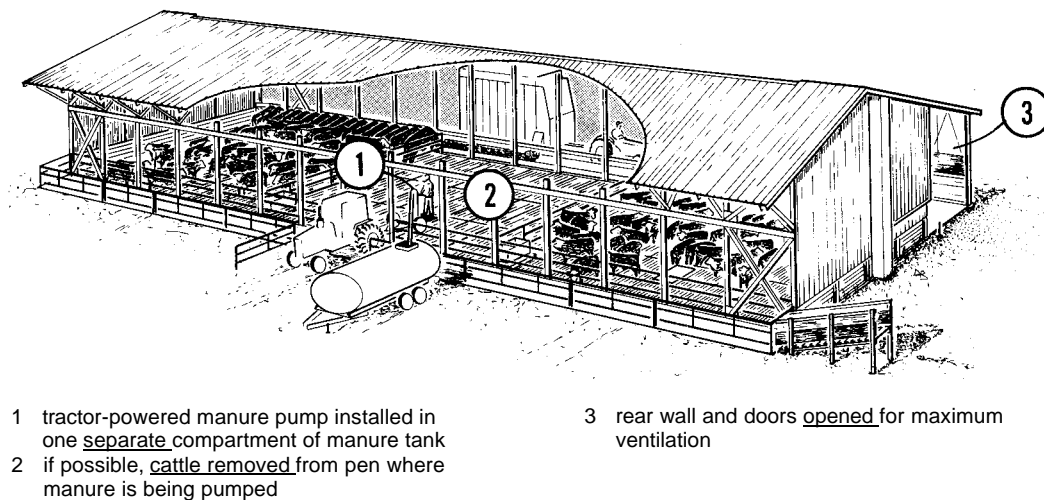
Open-front slotted-floor beef barn (from CPS plan M-1463)
